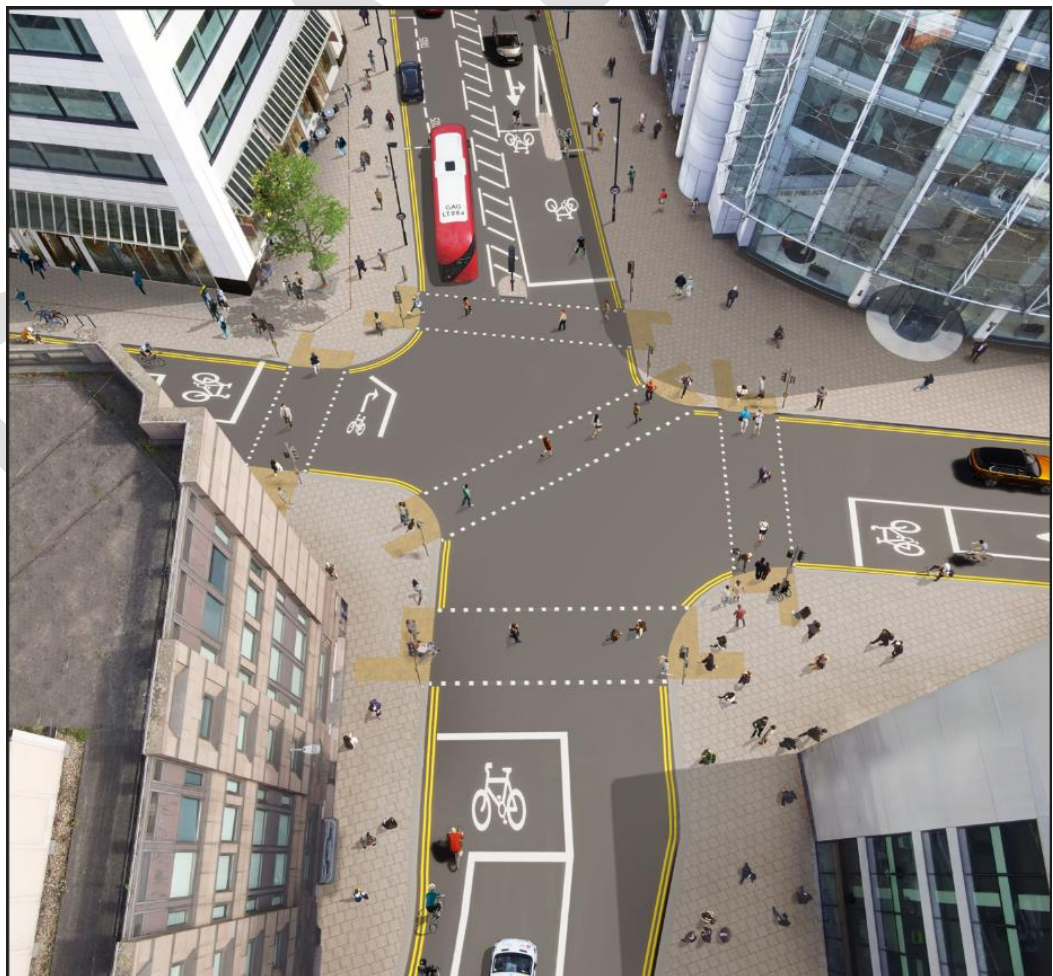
Ropemaker Street, Moorgate, Finsbury Pavement and South Place Junction crossing improvements (the red bus is on Finsbury Pavement)
